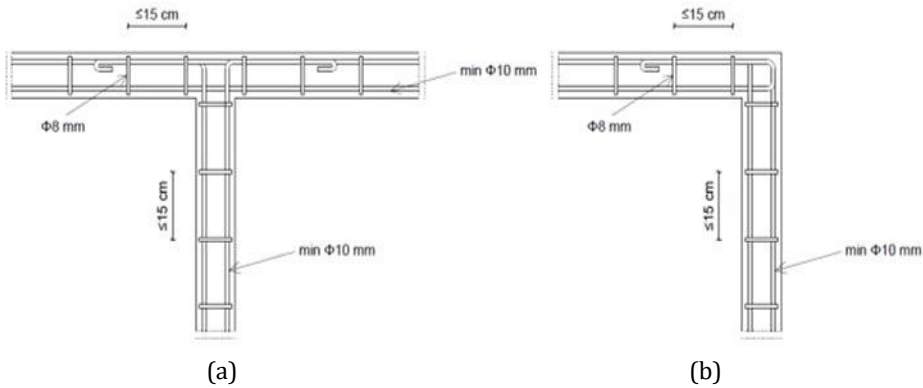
The design details for horizontal bonding girders at a joint (a) and a junction (b) are outlined. Adapted from [30]
